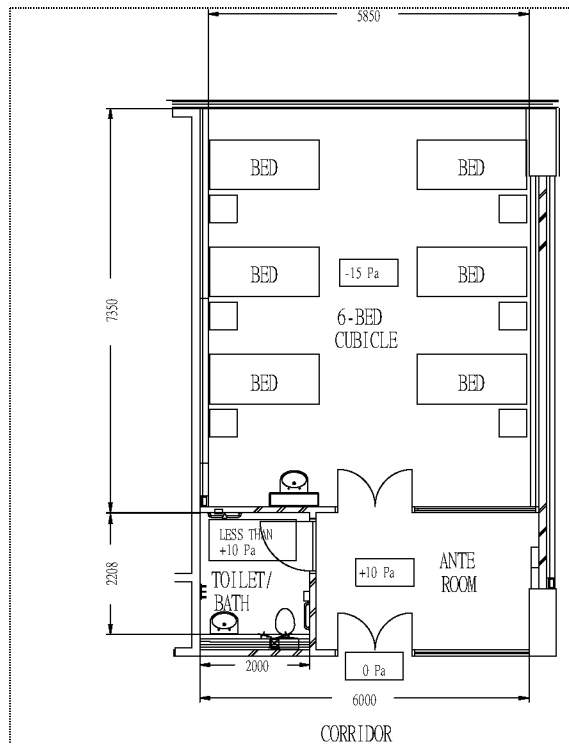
LAYOUT OF AN EXISTING ISOLATION ROOM OF 6 BEDS
